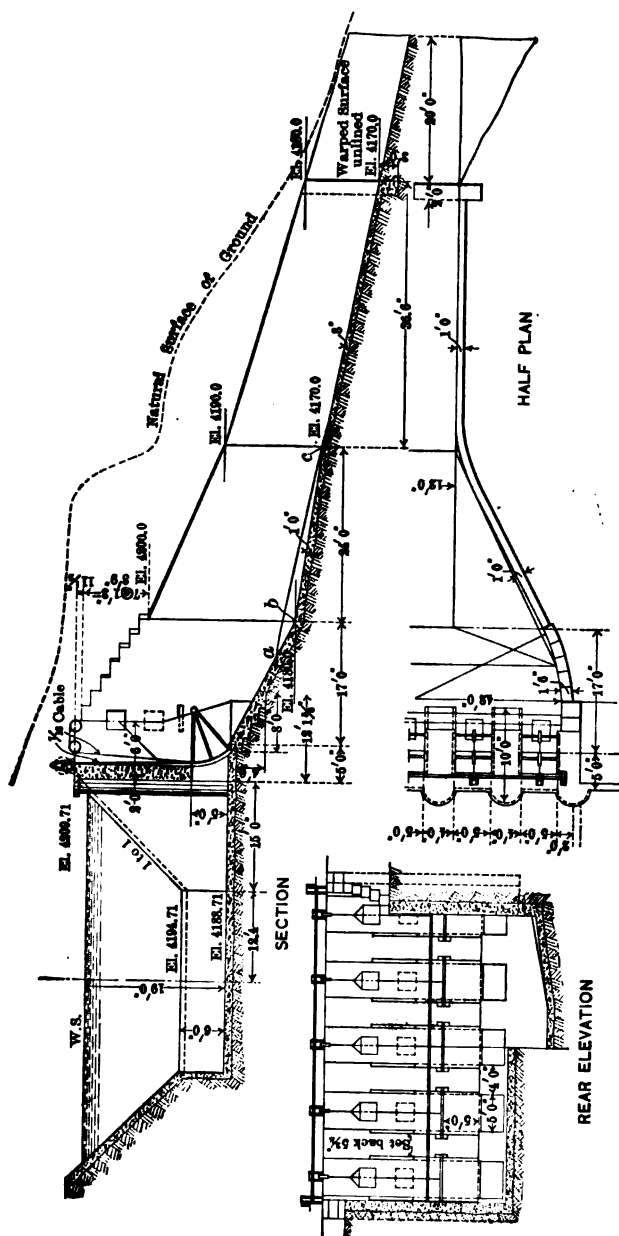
Wasteway, Lower Truckee Canal, Nevada.
